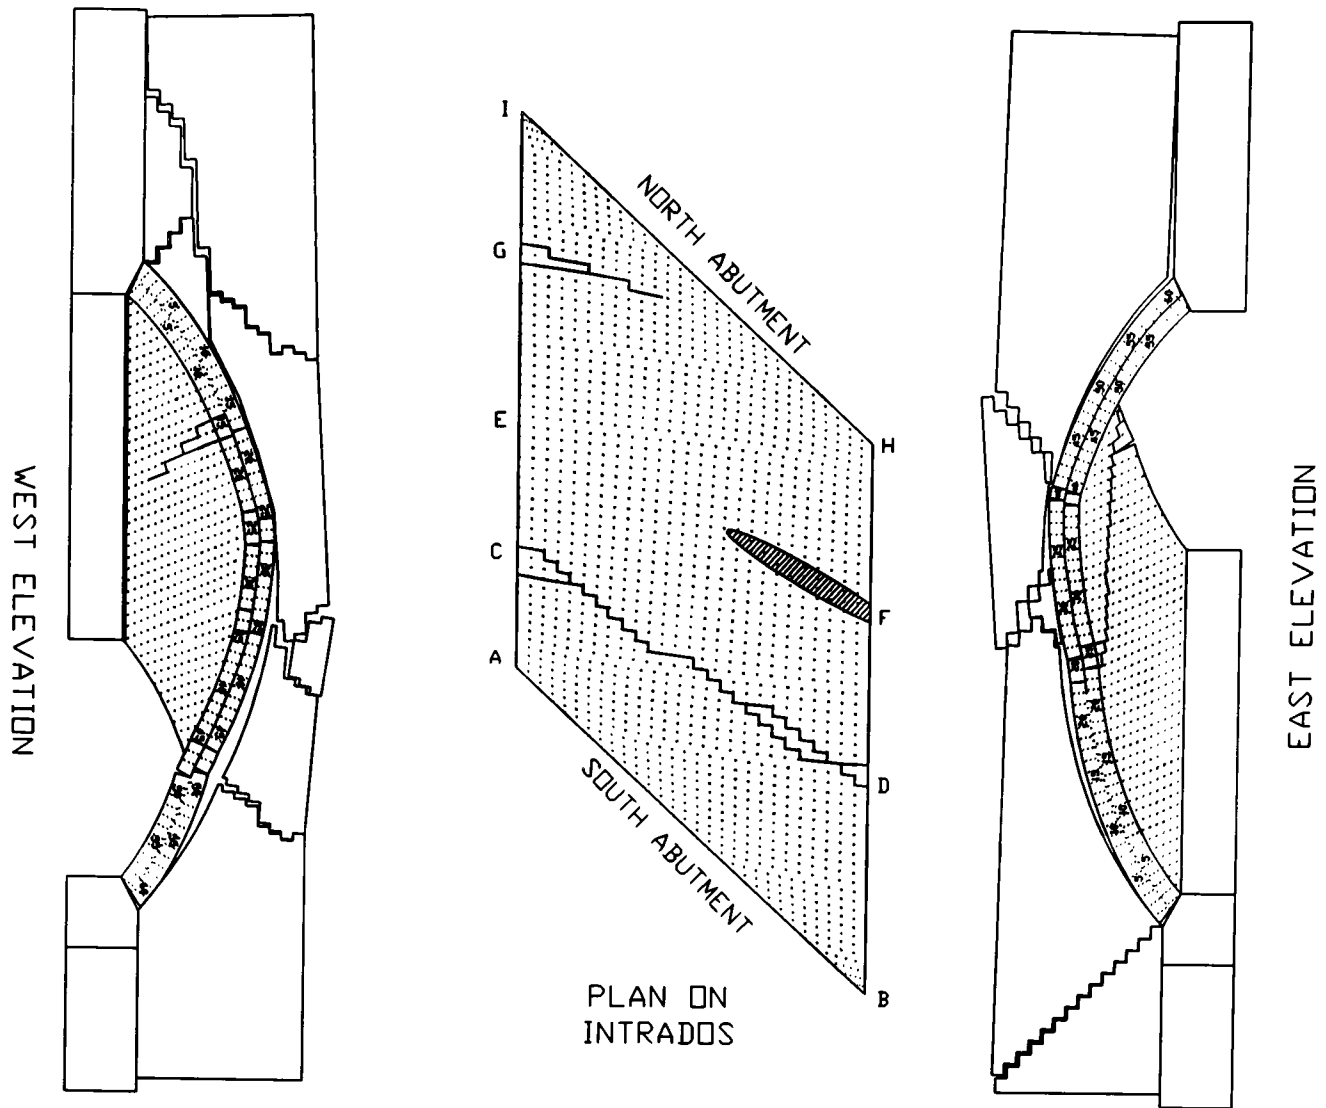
Collapse Mechanism of skewed arch bridge 3-3
